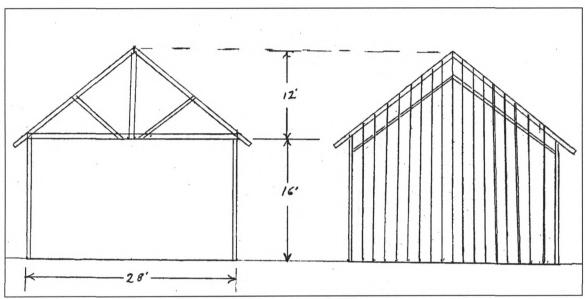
End wall framing, right-hand sketch depicts stud pattern (plan drawing by Floyd Soenksen)
